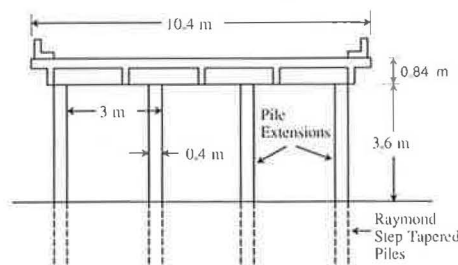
Typical cross section of the actual Struve Slough Bridge.
